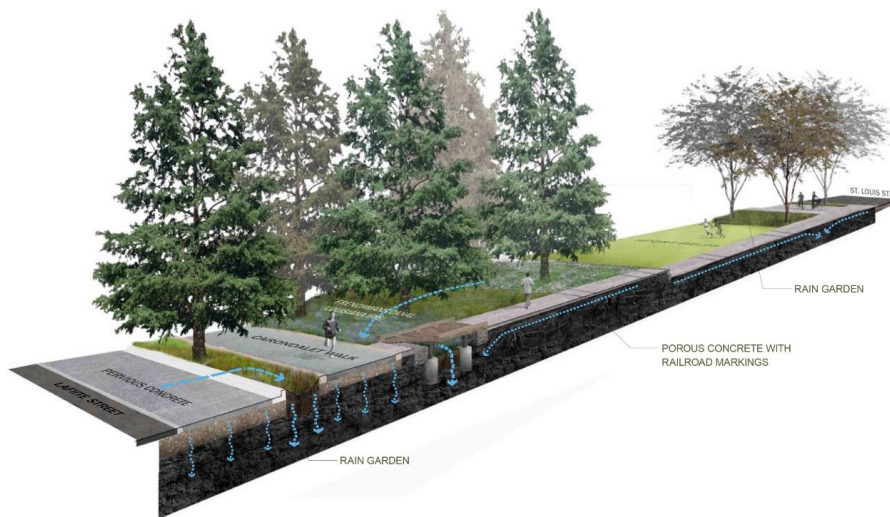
Typical rain garden cross section, located at Lafitte and St. Louis Streets between N. Claiborne Avenue and Galvez Street.
